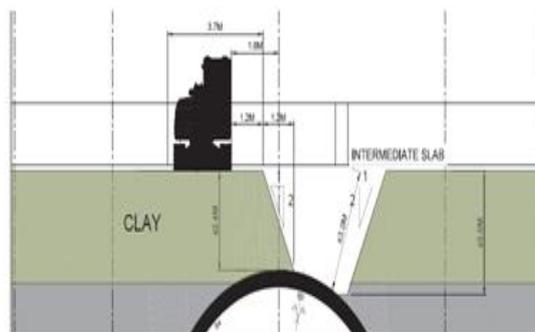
Activate intermediate slab and excavate to tunnel lining, [6]
